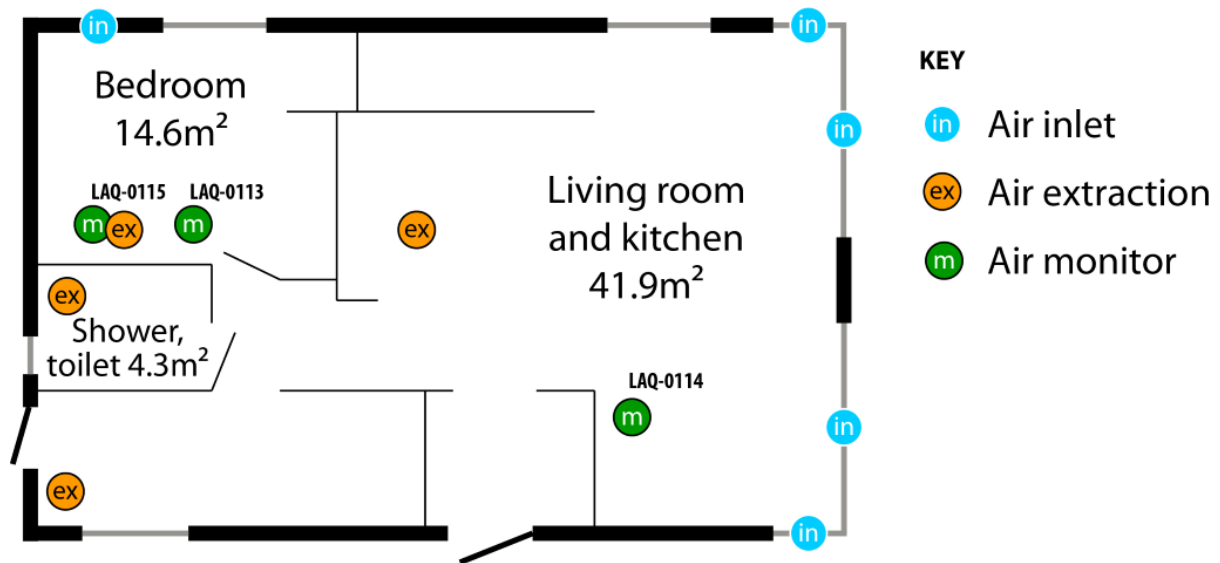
Plan of downstairs room layout showing main rooms, permanent air inlets, permanent forced air extraction points and location of additional Luvian air monitors used for the study, with LAQ identifying codes
